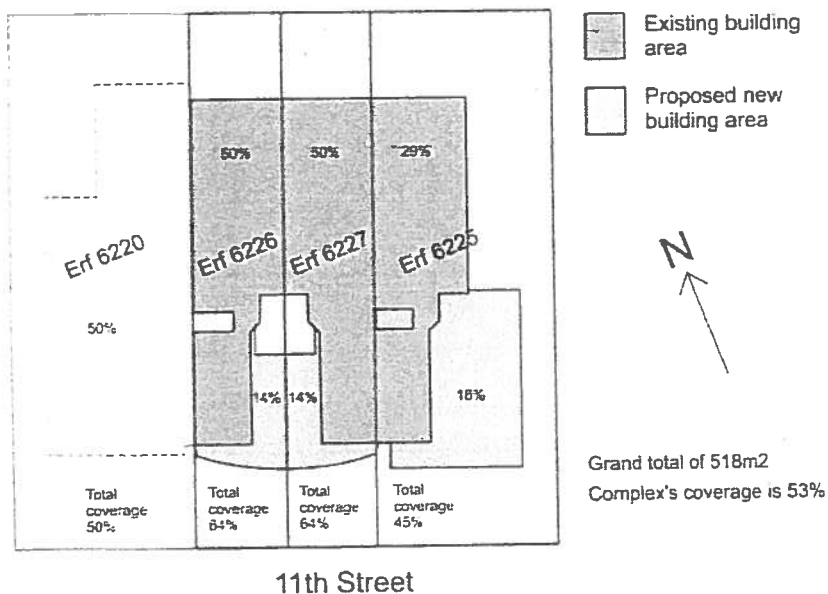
Sketch illustrating the additions to the town house complex resulting to the amendment of the Site Development Plan
